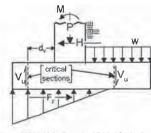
13 3.6.1-1—Example of Critical Section for Shear in Footings
